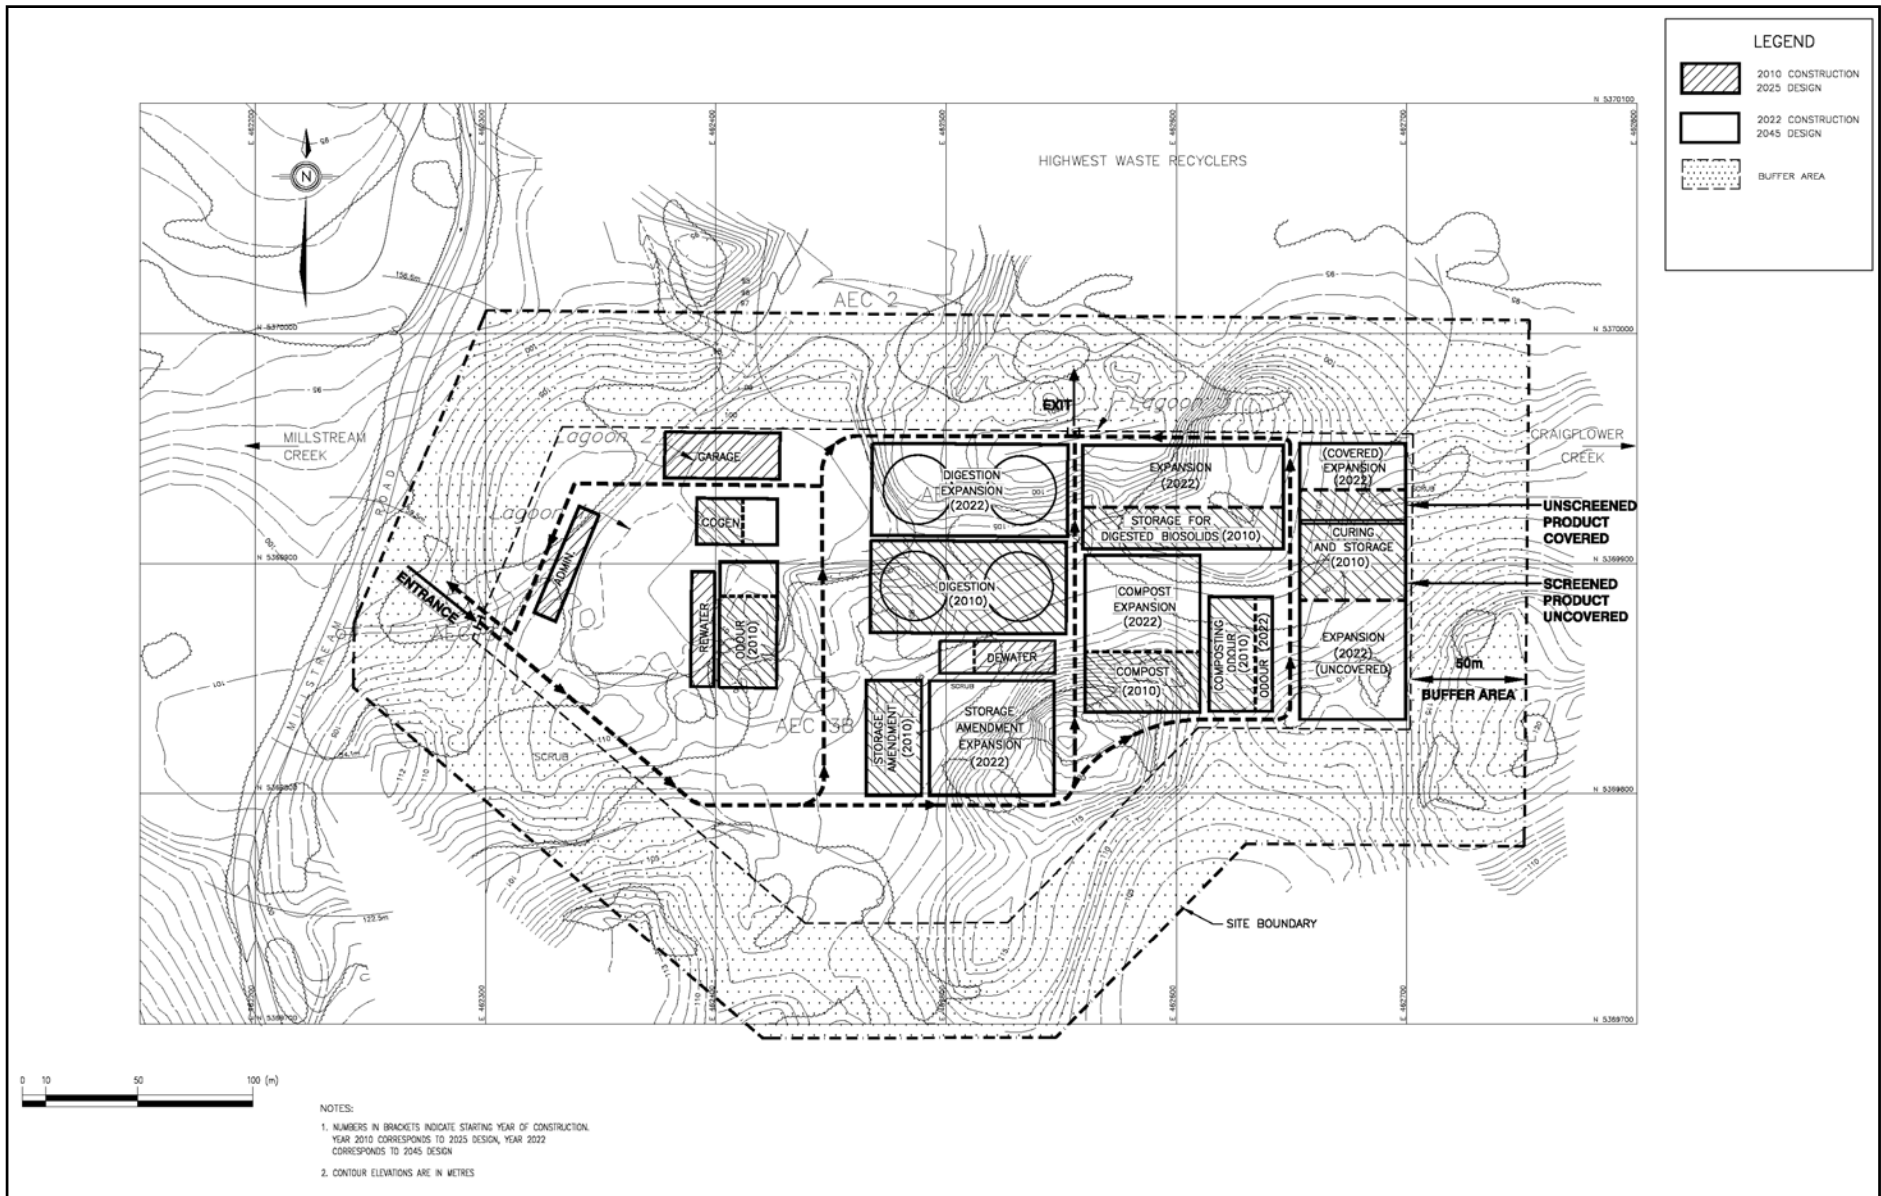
Site layout of biosolids facility at the Millstream site.
